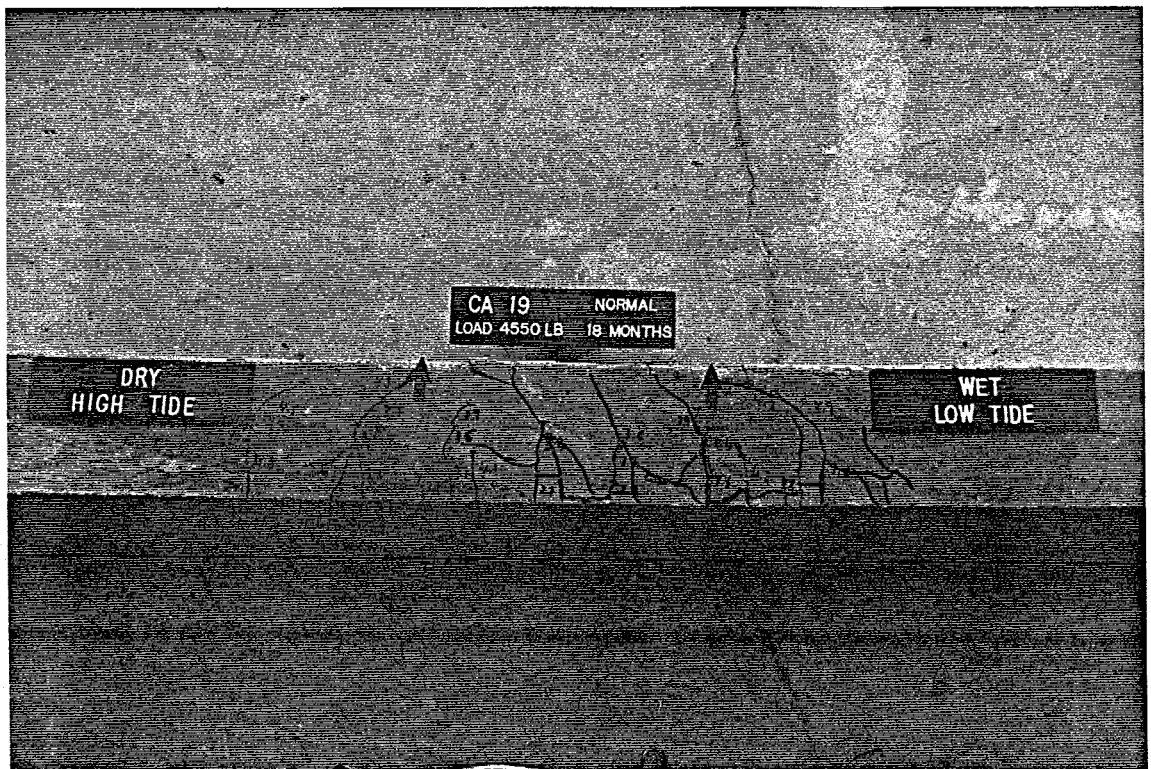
Crack Pattern for Beam CA 19 - Tested After 18 Months
